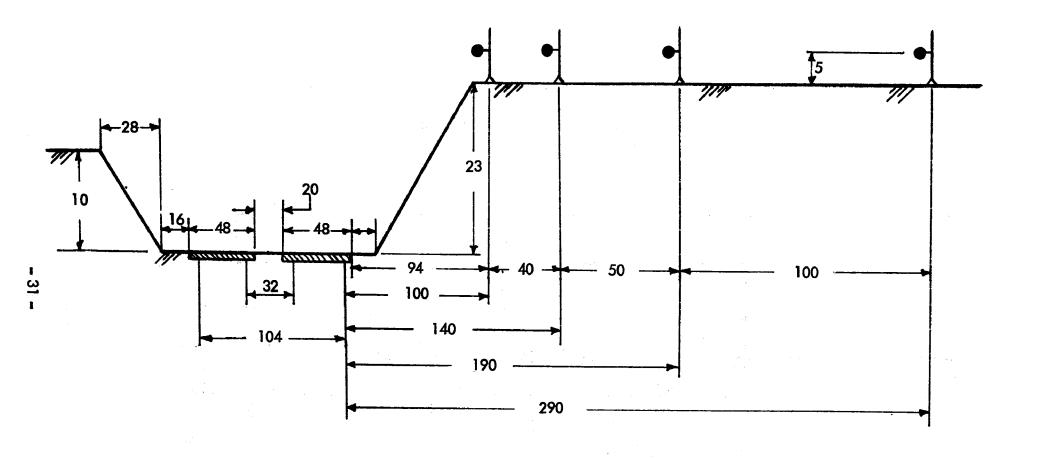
Site 13: Depressed Highway Configuration 8-Lane Freeway
